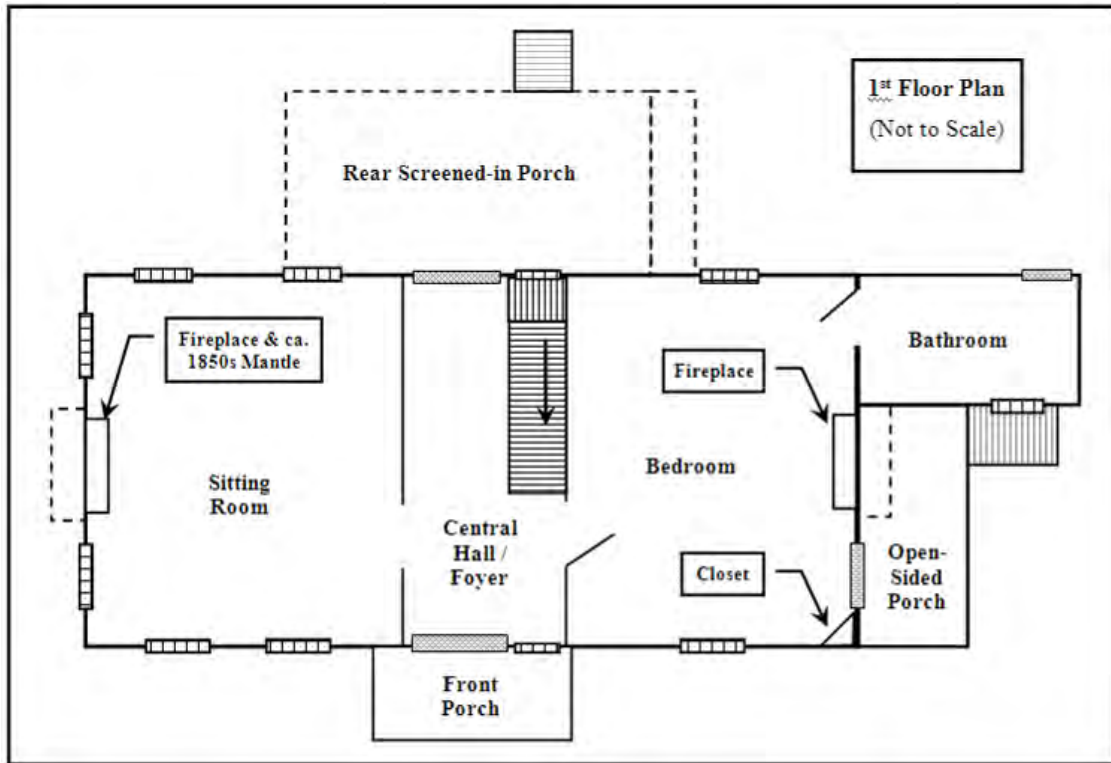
First Floor Interior Plan of Cedar Knoll Main House.
